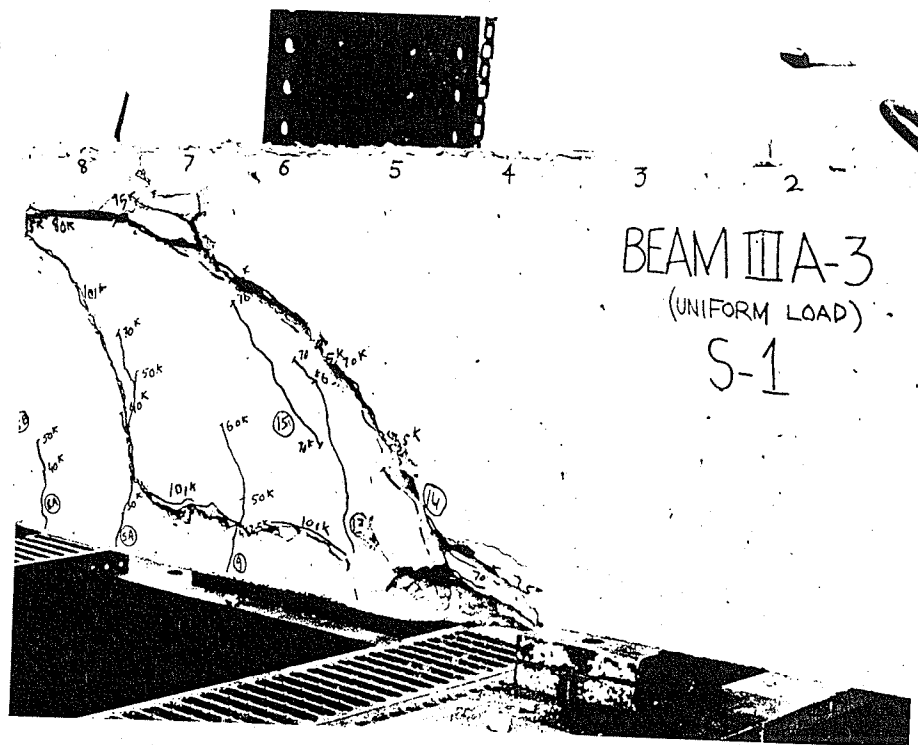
FAILURE OF BEAM IIIA-3 (END S-1)
